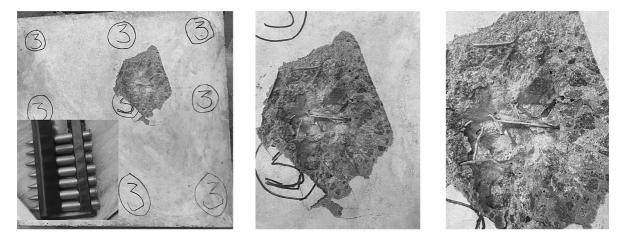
The surface of a steel fiber concrete slab after being shot with a 7.62 mm bullet
